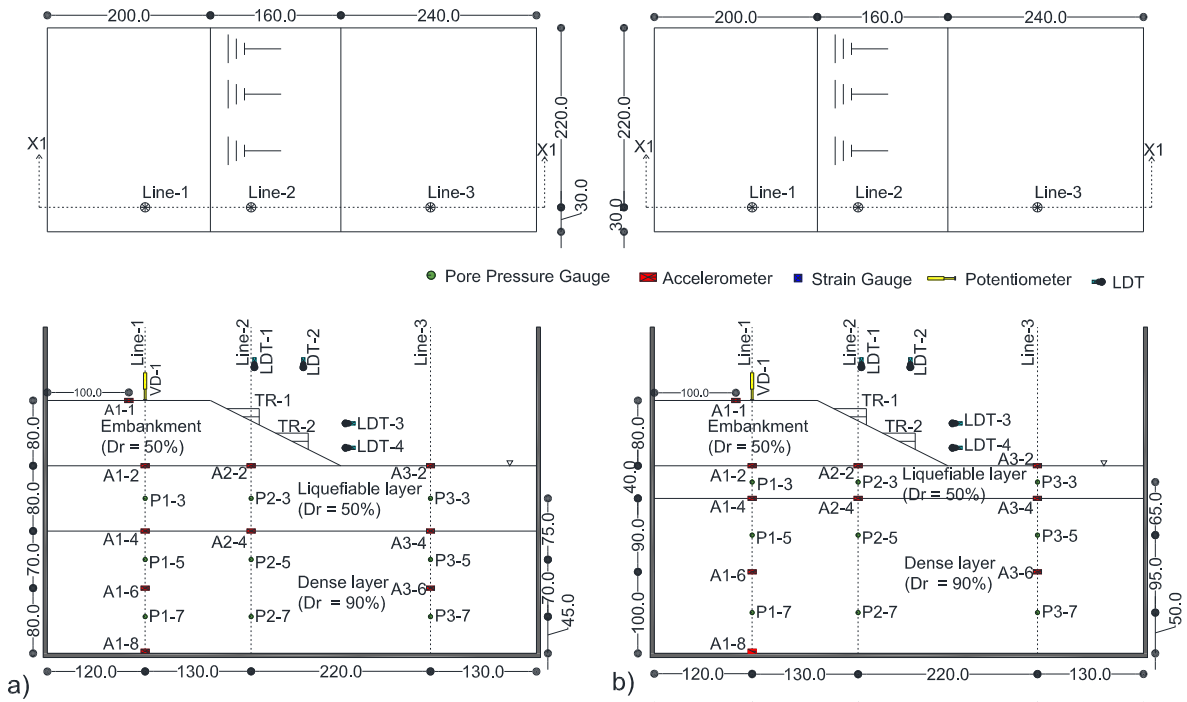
Plan and cross-sectional view of a) C-1 and b) C-2 (all the dimensions are in mm in model scale).
